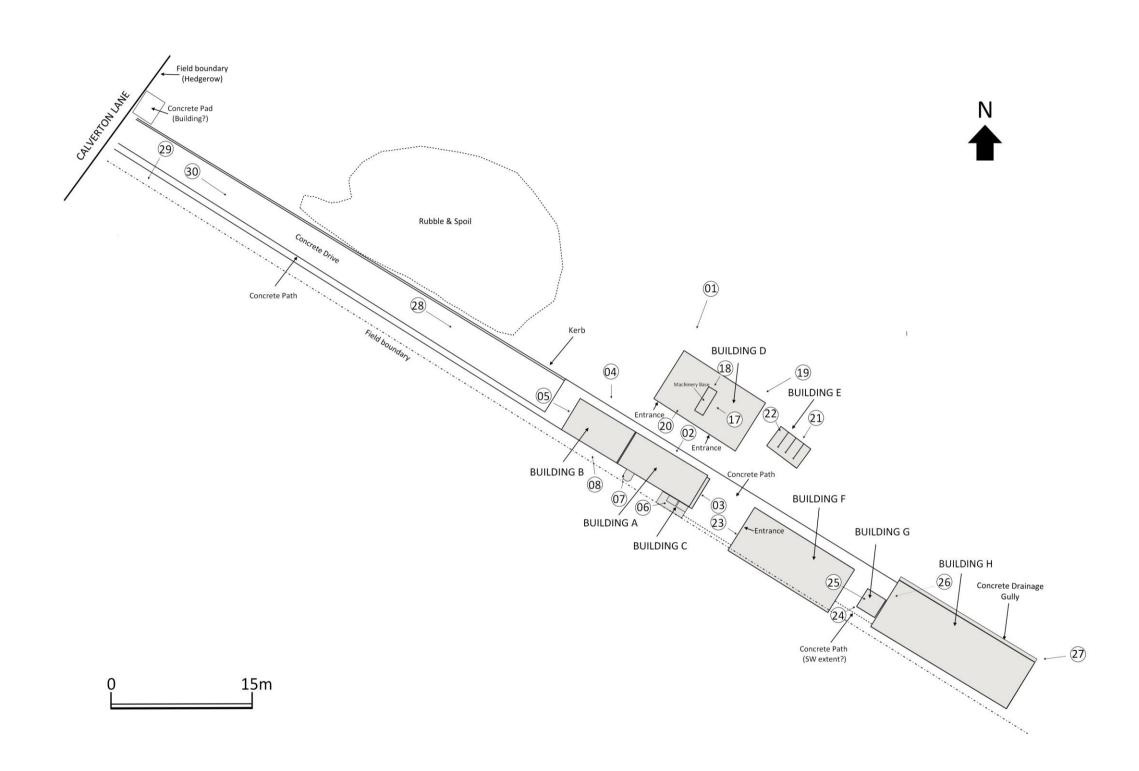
Plan showing layout of former complex of buildings at Upper Weald Radio Station
